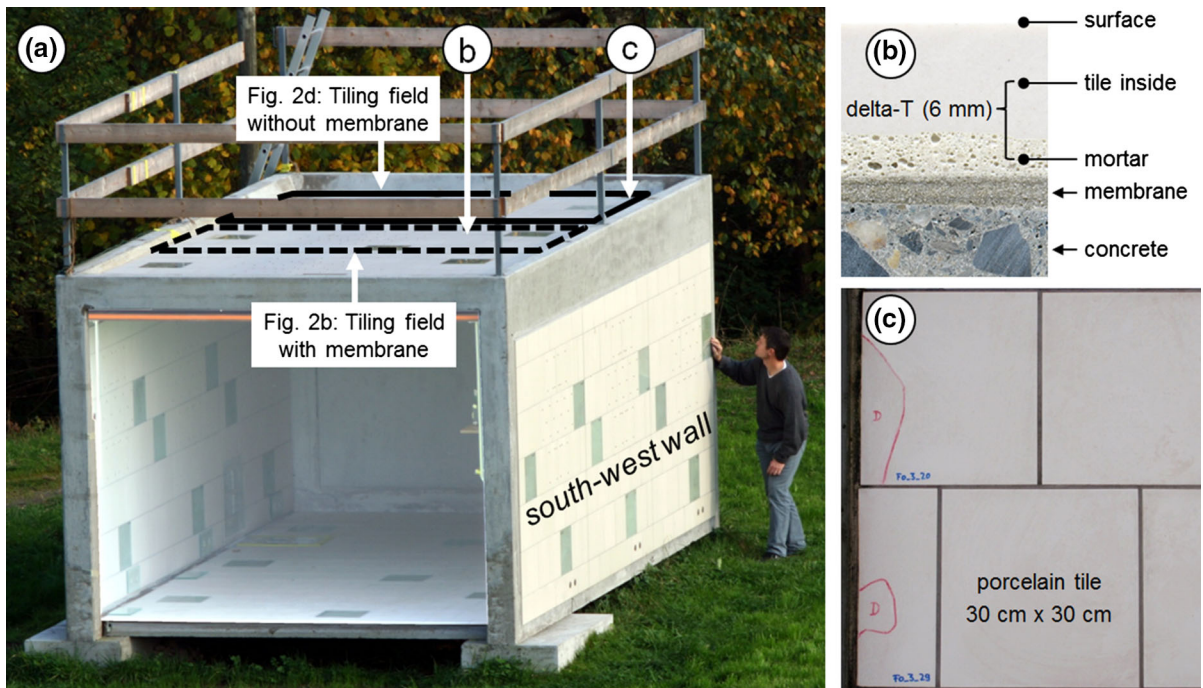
a Prefabricated garage provides walls and floors on the *inside* and *outside* as substrate for tilings. b Cross-section through floor tiling on the roof (balcony) with indicated
